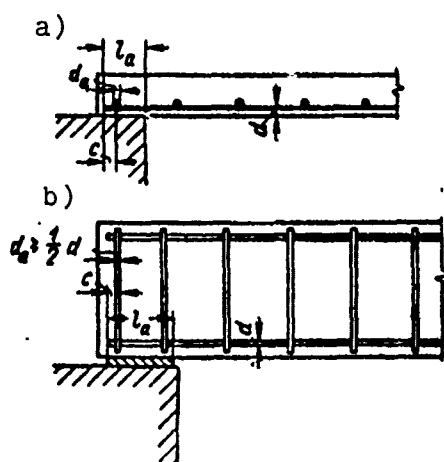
The anchoring of welded reinforcing grids or frameworks on the free supports of slabs and beams a - slab; b - beam.
